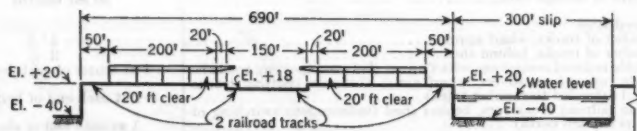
SECTION OF SLIP AND SHED, FINGER-PIER PLAN
